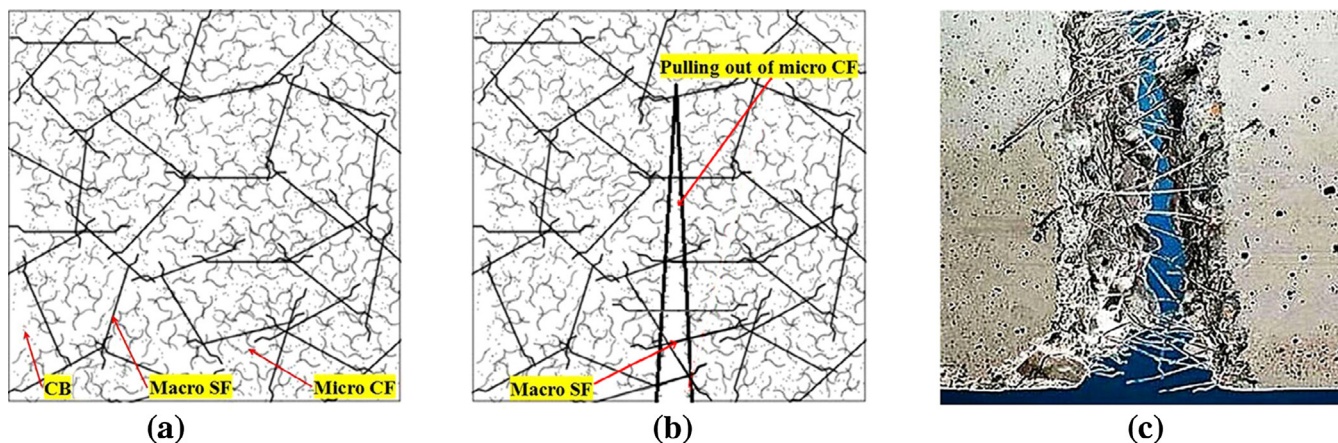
Conductive network of triphasic materials in the concrete matrix (a) before cracking, (b) after cracking, (c) macro SF cross concrete crack [21].
